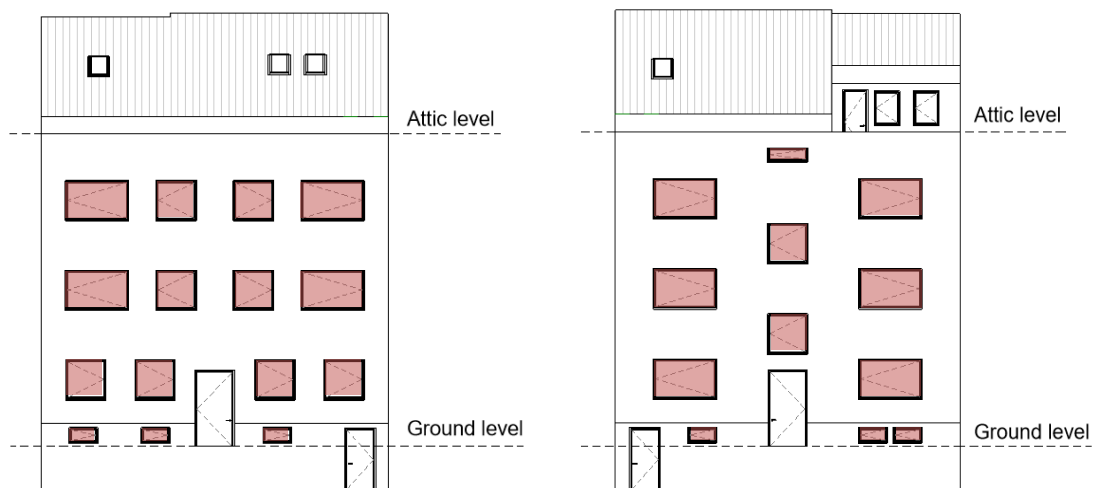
Façade-view of building B, highlighting the windows in need of replacement.
